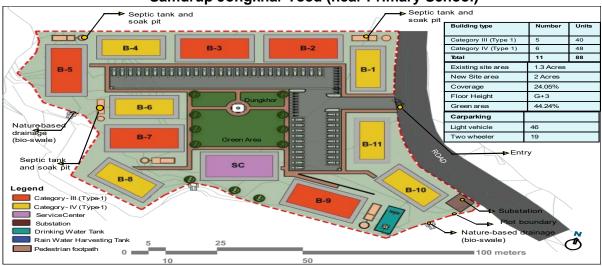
Layout plan of Existing and Proposed Works of Proposed Housing Site at Samdrup Jongkhar Toed (near Primary School)
